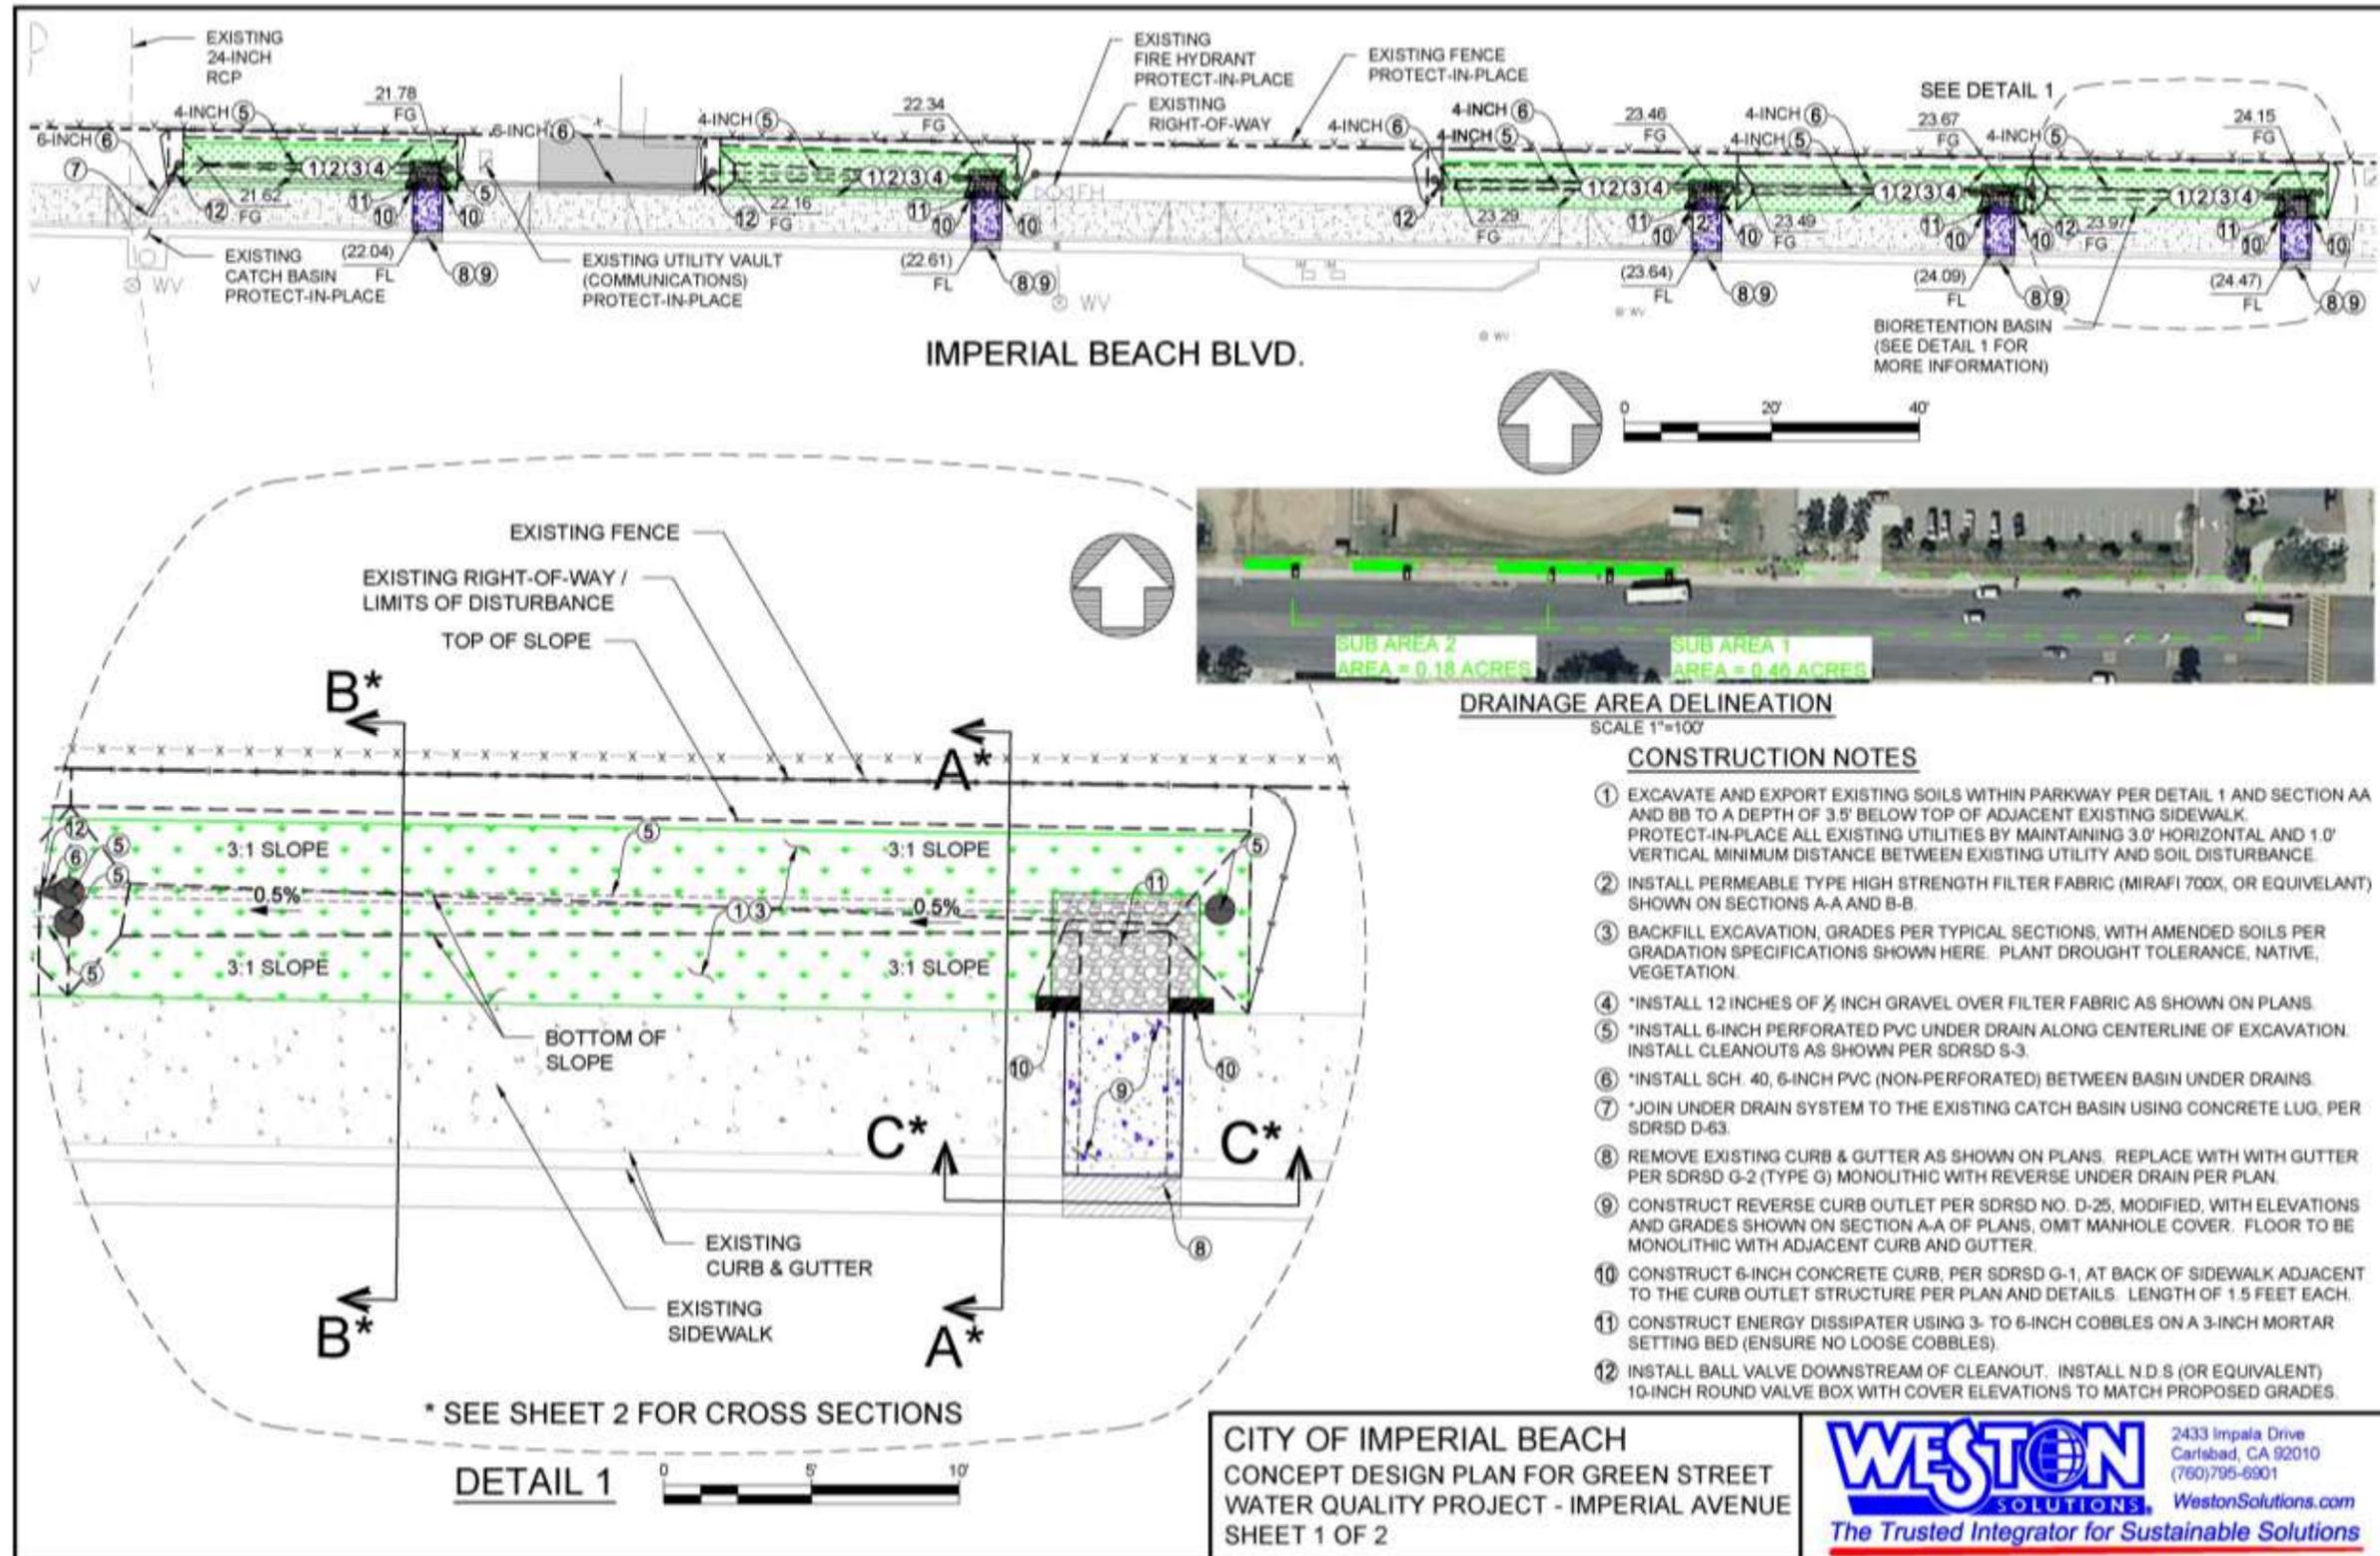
Imperial Beach Boulevard Parkway Bioretention Basins Concept Design Plan (1 of 2)
